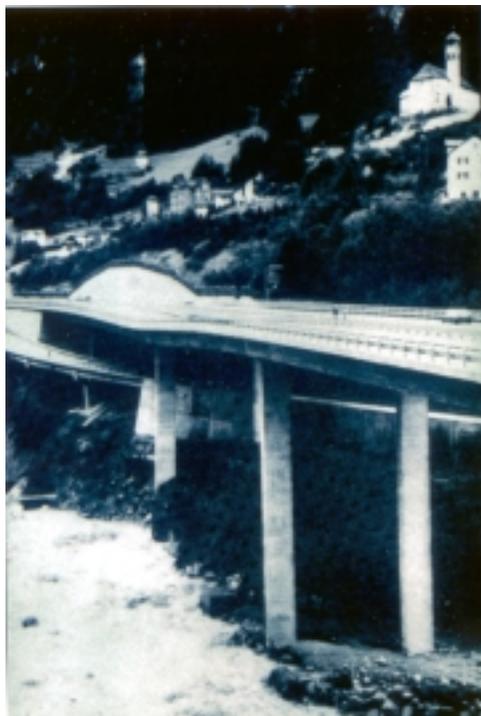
A main pier of the Reuss Bridge, at Wassen, was undermined by scour from excessive flash floods in 1987, but the bridge remained intact.
